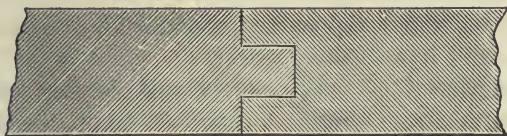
A Section through the Joint between two Floor Boards, showing how they should be tongued and grooved.
